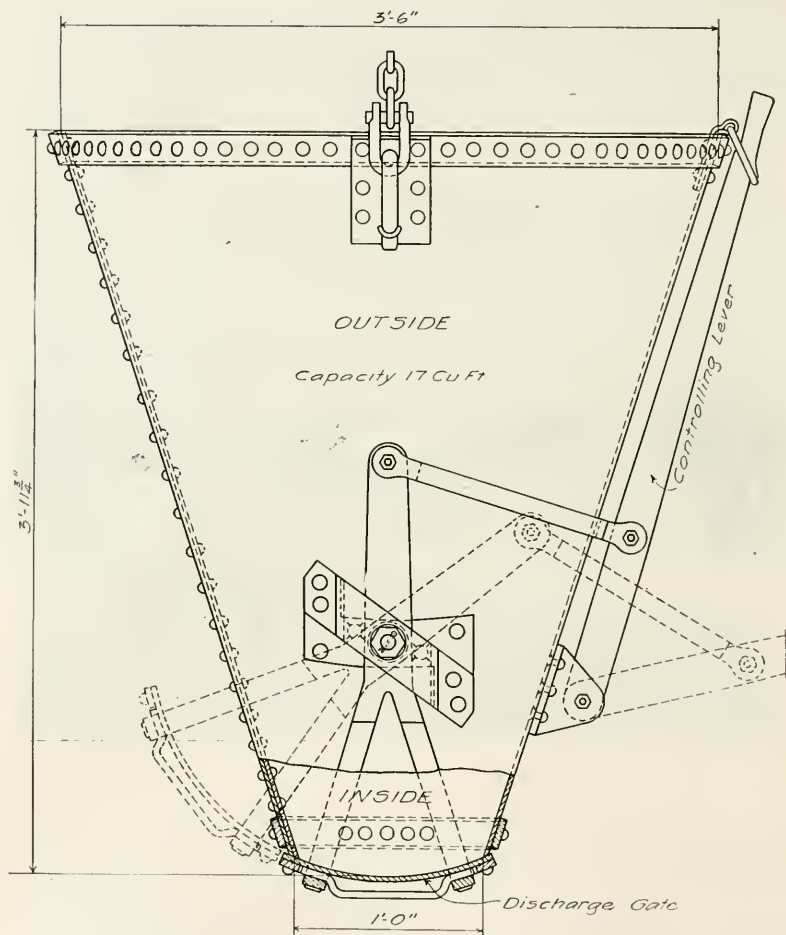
SIDE ELEVATION OF CONCRETE BUCKET.
